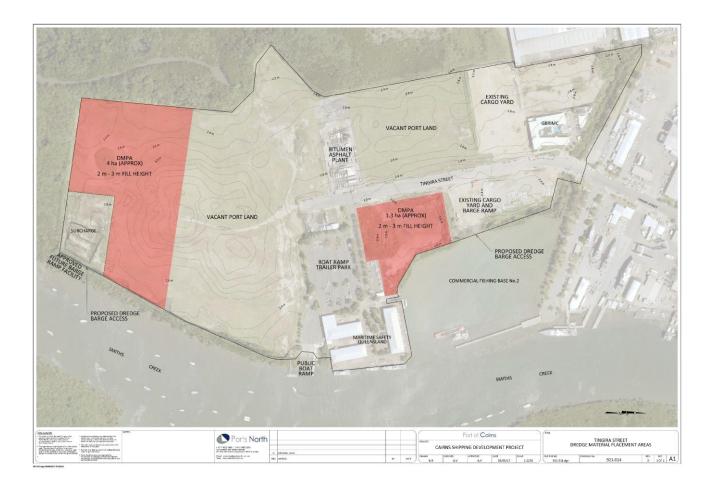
Proposed site layout showing barge locations and proposed fill areas (in red).
